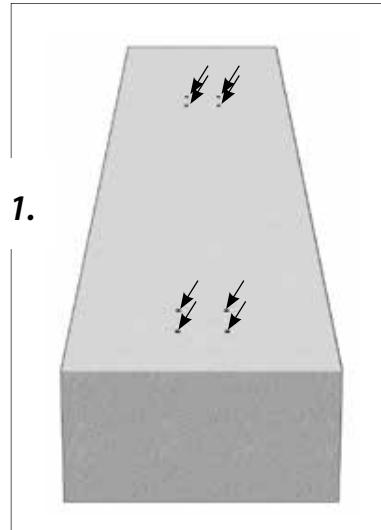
1 (drilled holes on the concrete foundation)
